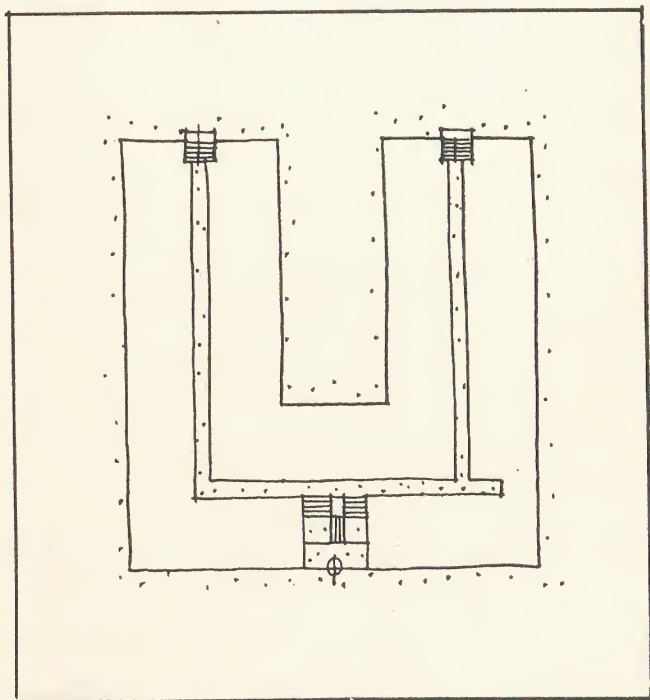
ILLUSTRATING DISPOSITION OF STAIRCASES ON PLAN
